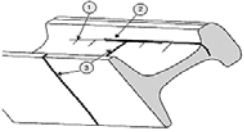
Figure SUB-PART D – 15 – Defective Field Weld or Defective Plant Weld
